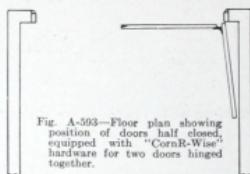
Floor plan showing position of doors half closed, equipped with "CornR-Wise" hardware for two doors hinged together.
